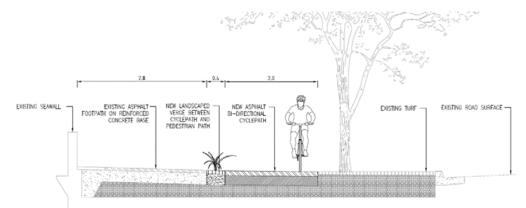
Proposed cross-section of the upgraded pedestrian path / cycle path. (Source: New South Head Road – Cycleway Upgrade: Traffic and Parking Report, April 2019)
